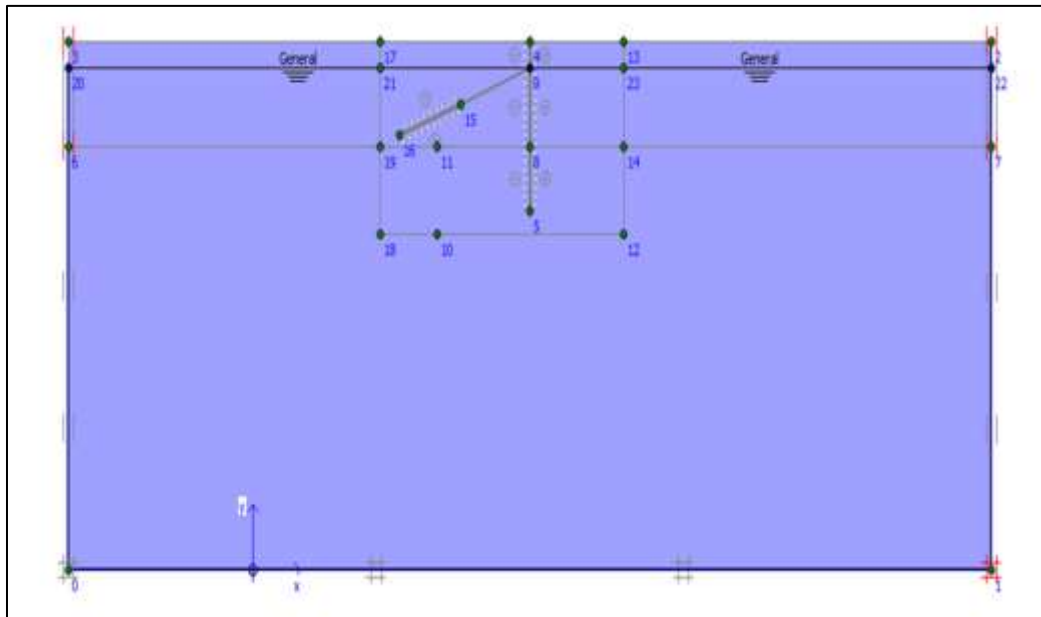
Schematic of Anchored Sheet Pile Wall and Penetration Depths Analyzed for adjusted the water level to be at the anchor level on both sides of the wall
